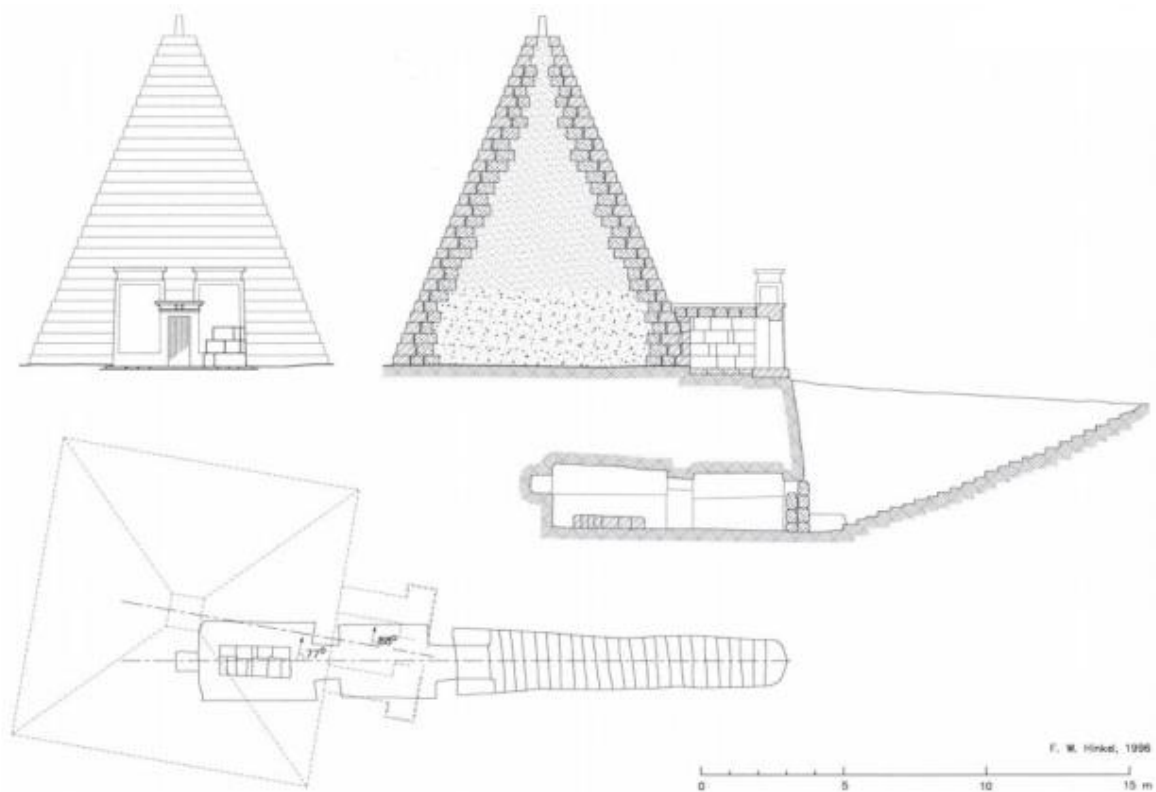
Pyramid BEG S 10: Plan of the substructure, section and elevation.
